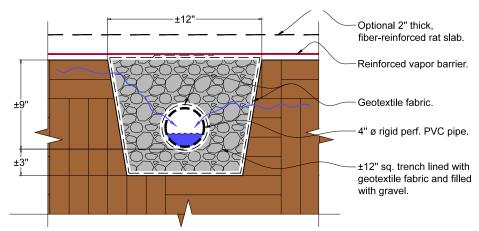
Opt. 1-3 Crawlspace Drainage Line Section
